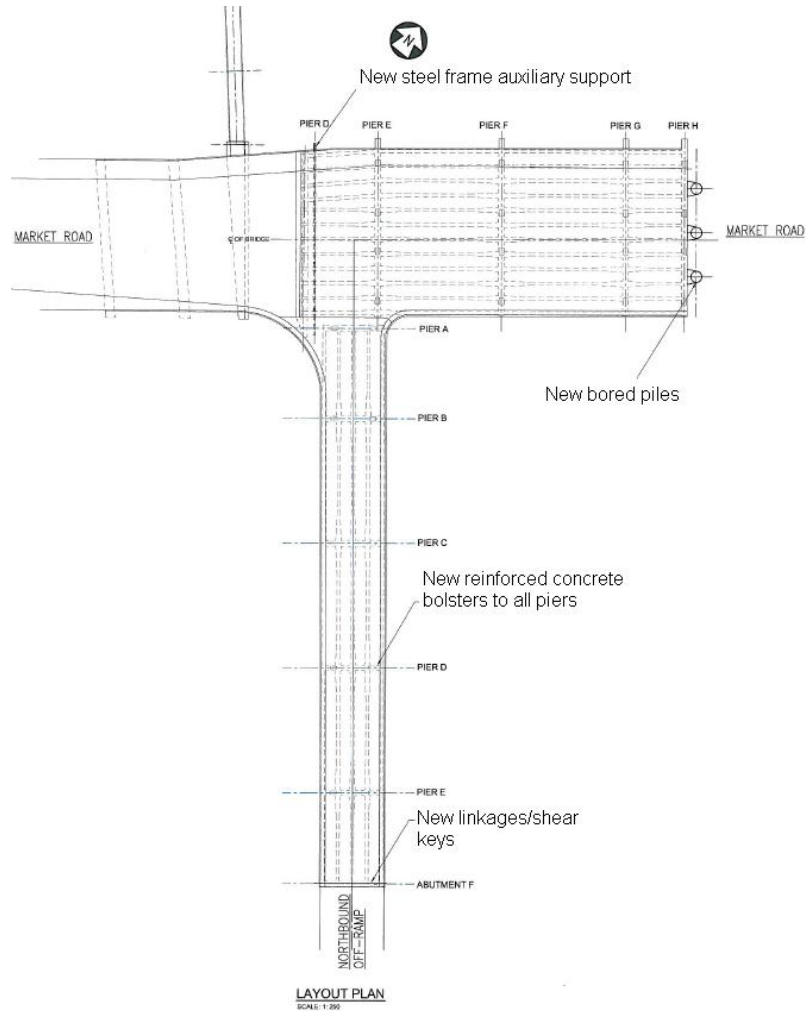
Market Road Underpass – layout and proposed improvements locations
